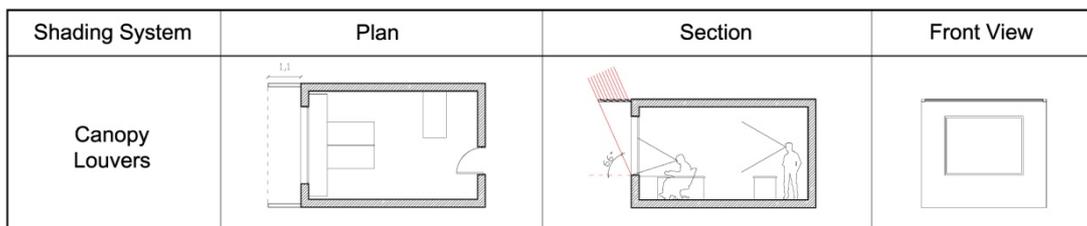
Plan, section and Front view of Canopy Louvers shading System
